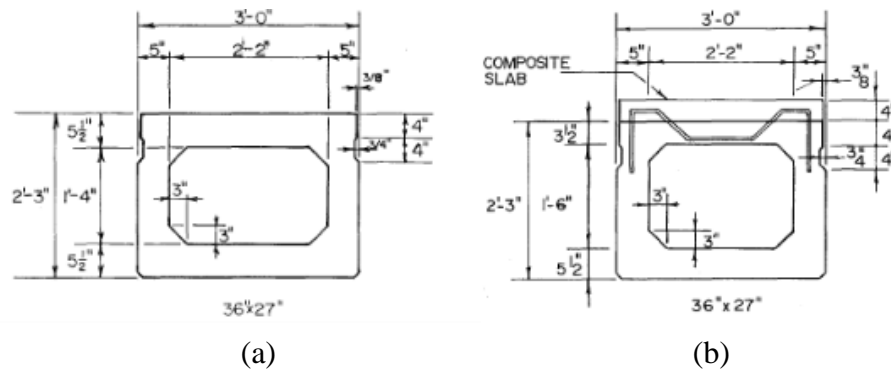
Typical box girder sections: (a) regular, non-composite section and (b) composite section [38]
